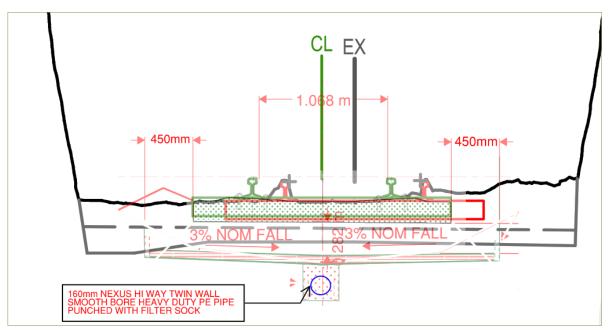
Typical track and subsoil drainage detail through extent of Tunnel
